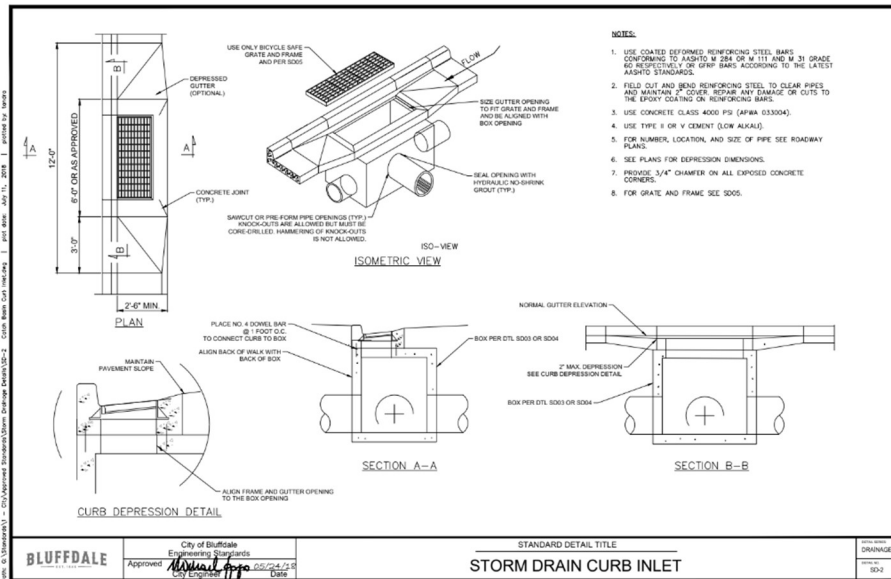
Sample CAD Drawing of Inlet Box from City Design Manual
